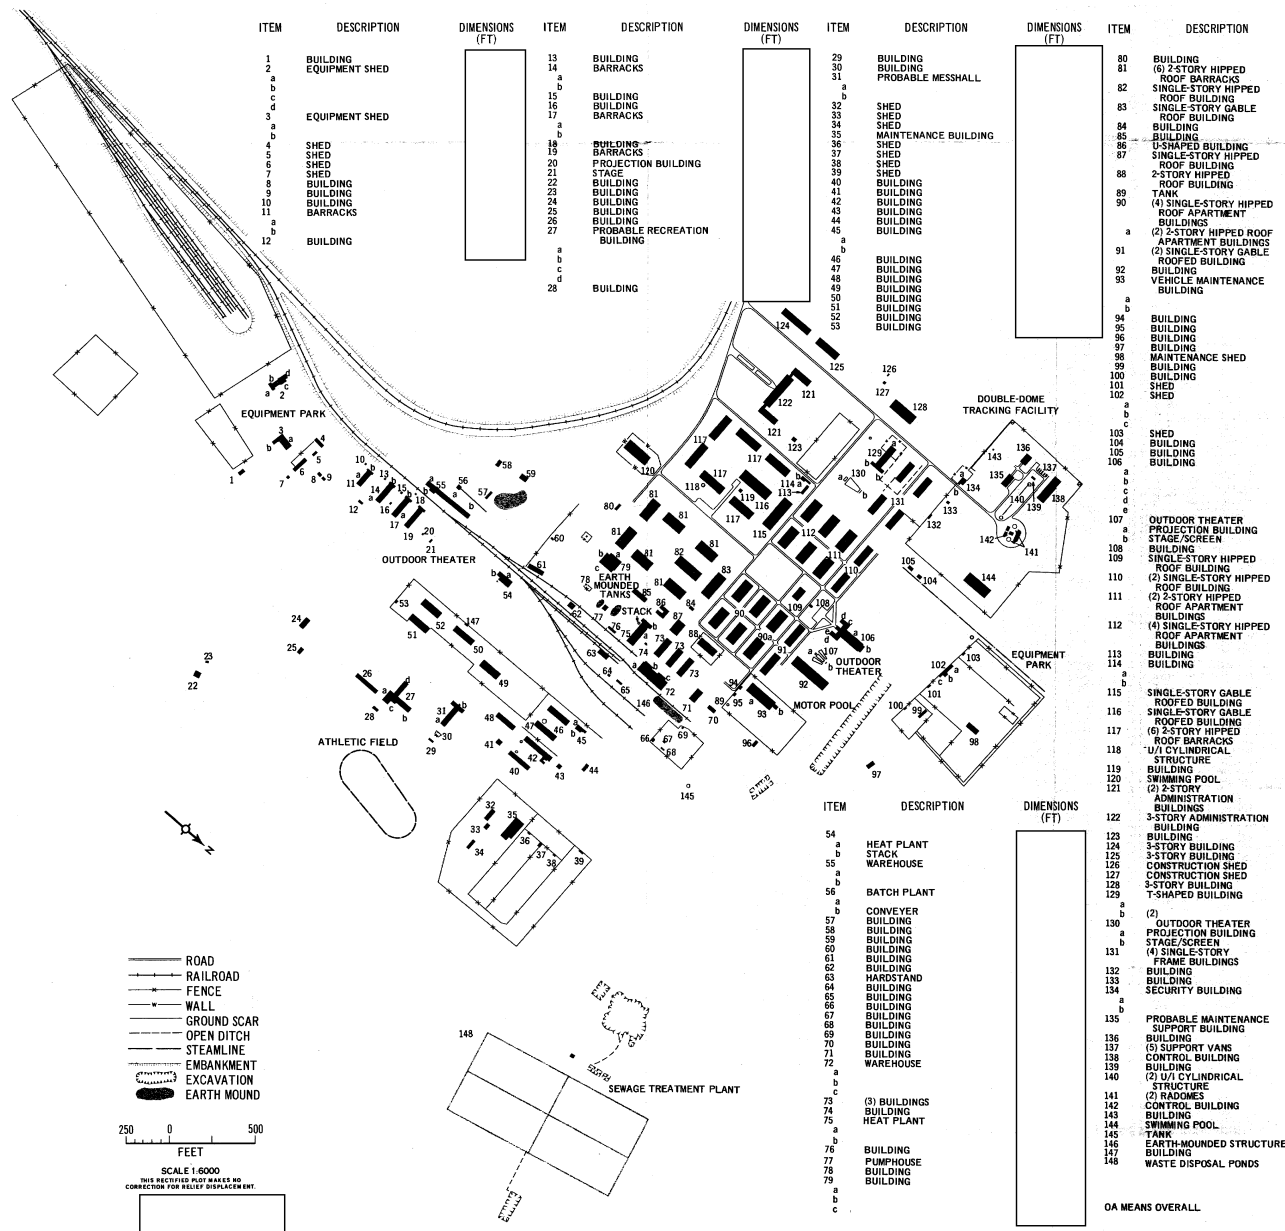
LAYOUT OF COMPLEX SUPPORT FACILITY, LAUNCH COMPLEX B, TTMT.
